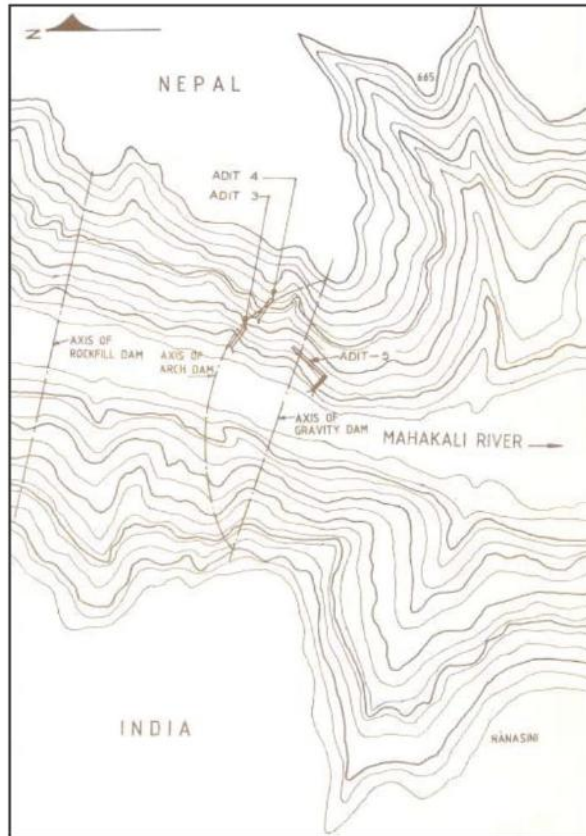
Location plan of proposed concrete gravity, arch and rock-fill dams along with adits (drifts) A-3, A-4 and A-5 at left bank of Pancheshwar multipurpose project
